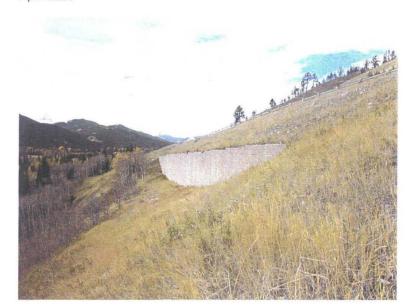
(top) – September 2005 – Facing west across the retaining wall below the road.
